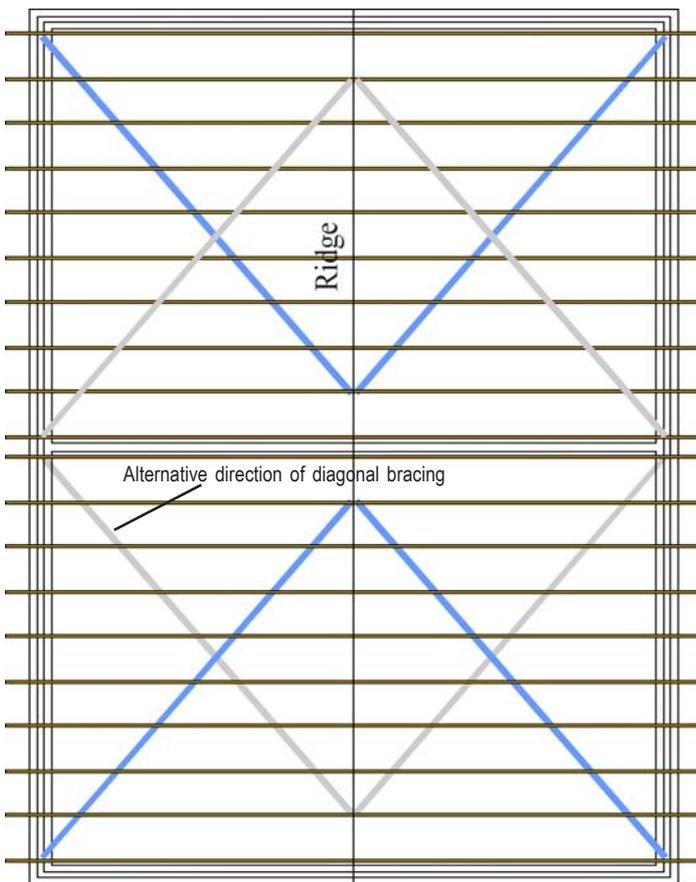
Plan of rafter diagonal bracing arrangement on a wide fronted roof
